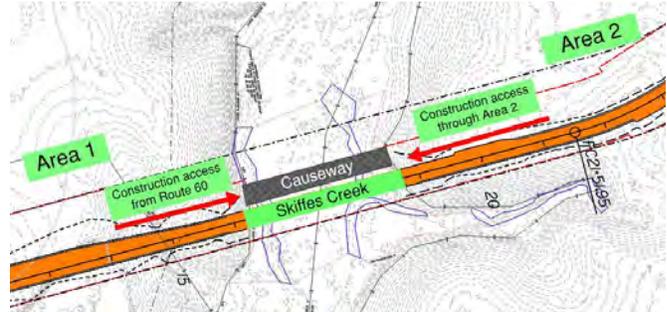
Proposed Access to Skiffes Bridge
